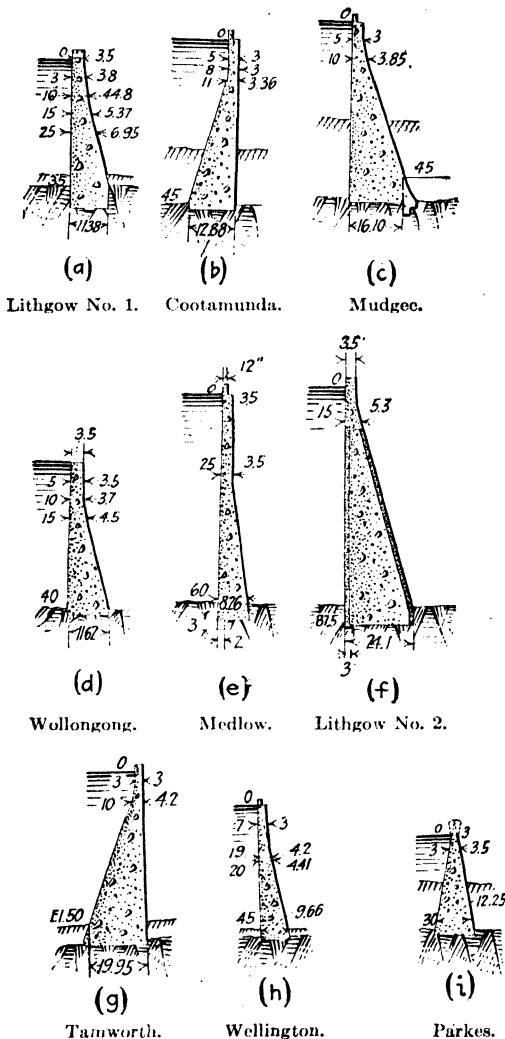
Sections of curved masonry dams. Dimensions in feet.
